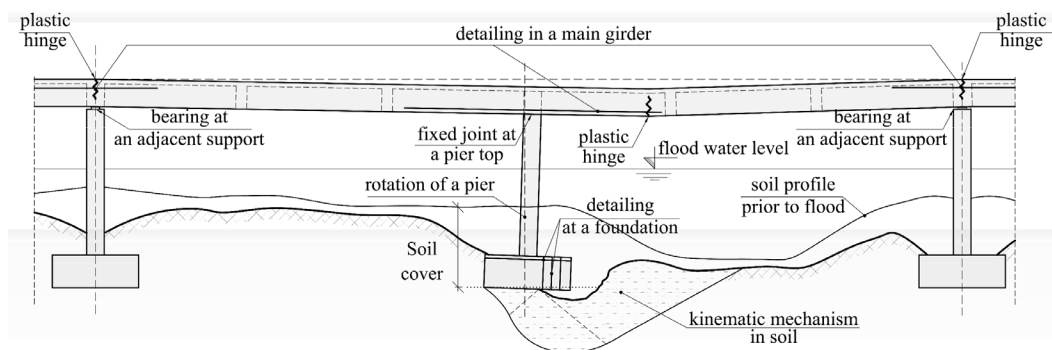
A possible failure mode (FM type 3) of a multiple-span RC girder bridge.
